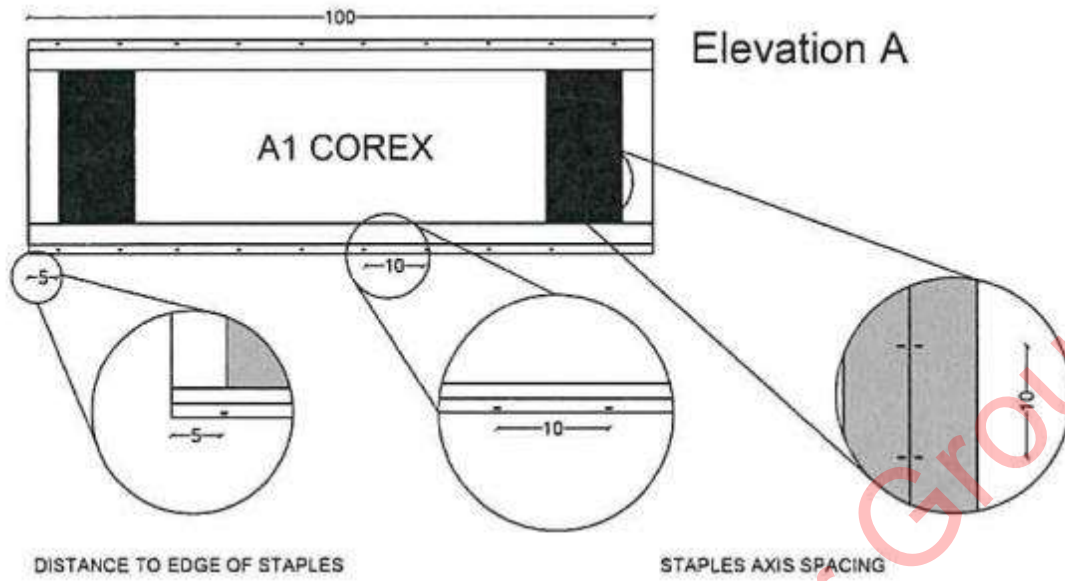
Fixing method of the first board layer (Extracted from RFTR18001 test report)
